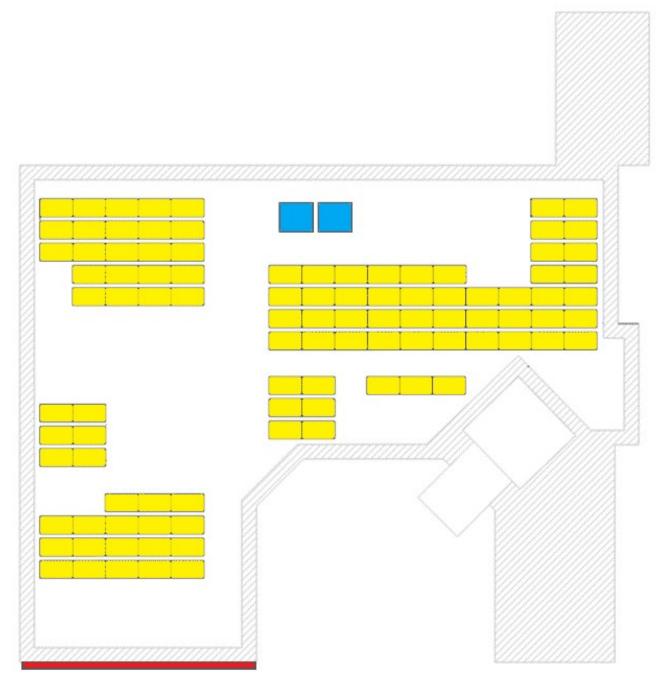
Proposed system indicative roof equipment layout, with solar panels in yellow, solar water heater collectors in blue, and the solar air heater collector in red (oriented vertically along wall face)
